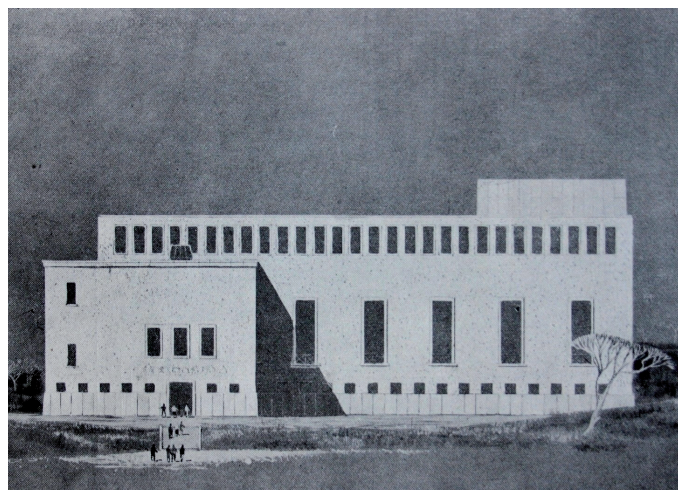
Power station, Technical University of Heavy Industry in Miskolc. Facade plan. Designer: József Schall 1953. [24, p. 17].
